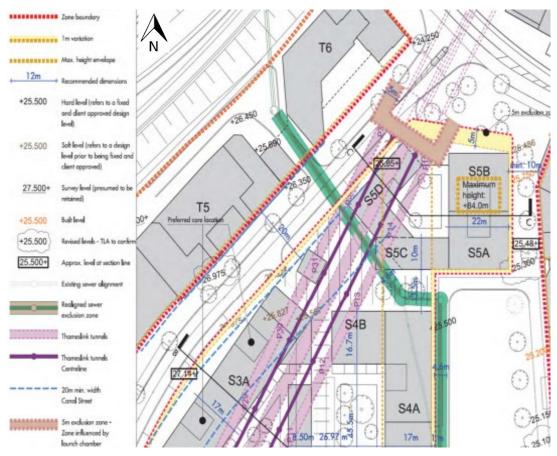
Site Constraints Plan showing the Thameslink Tunnels and Camden Sewer (with Chilton Square positioned between Plots S3, S4 and S5). Source: S Plots Briefing Pack.
